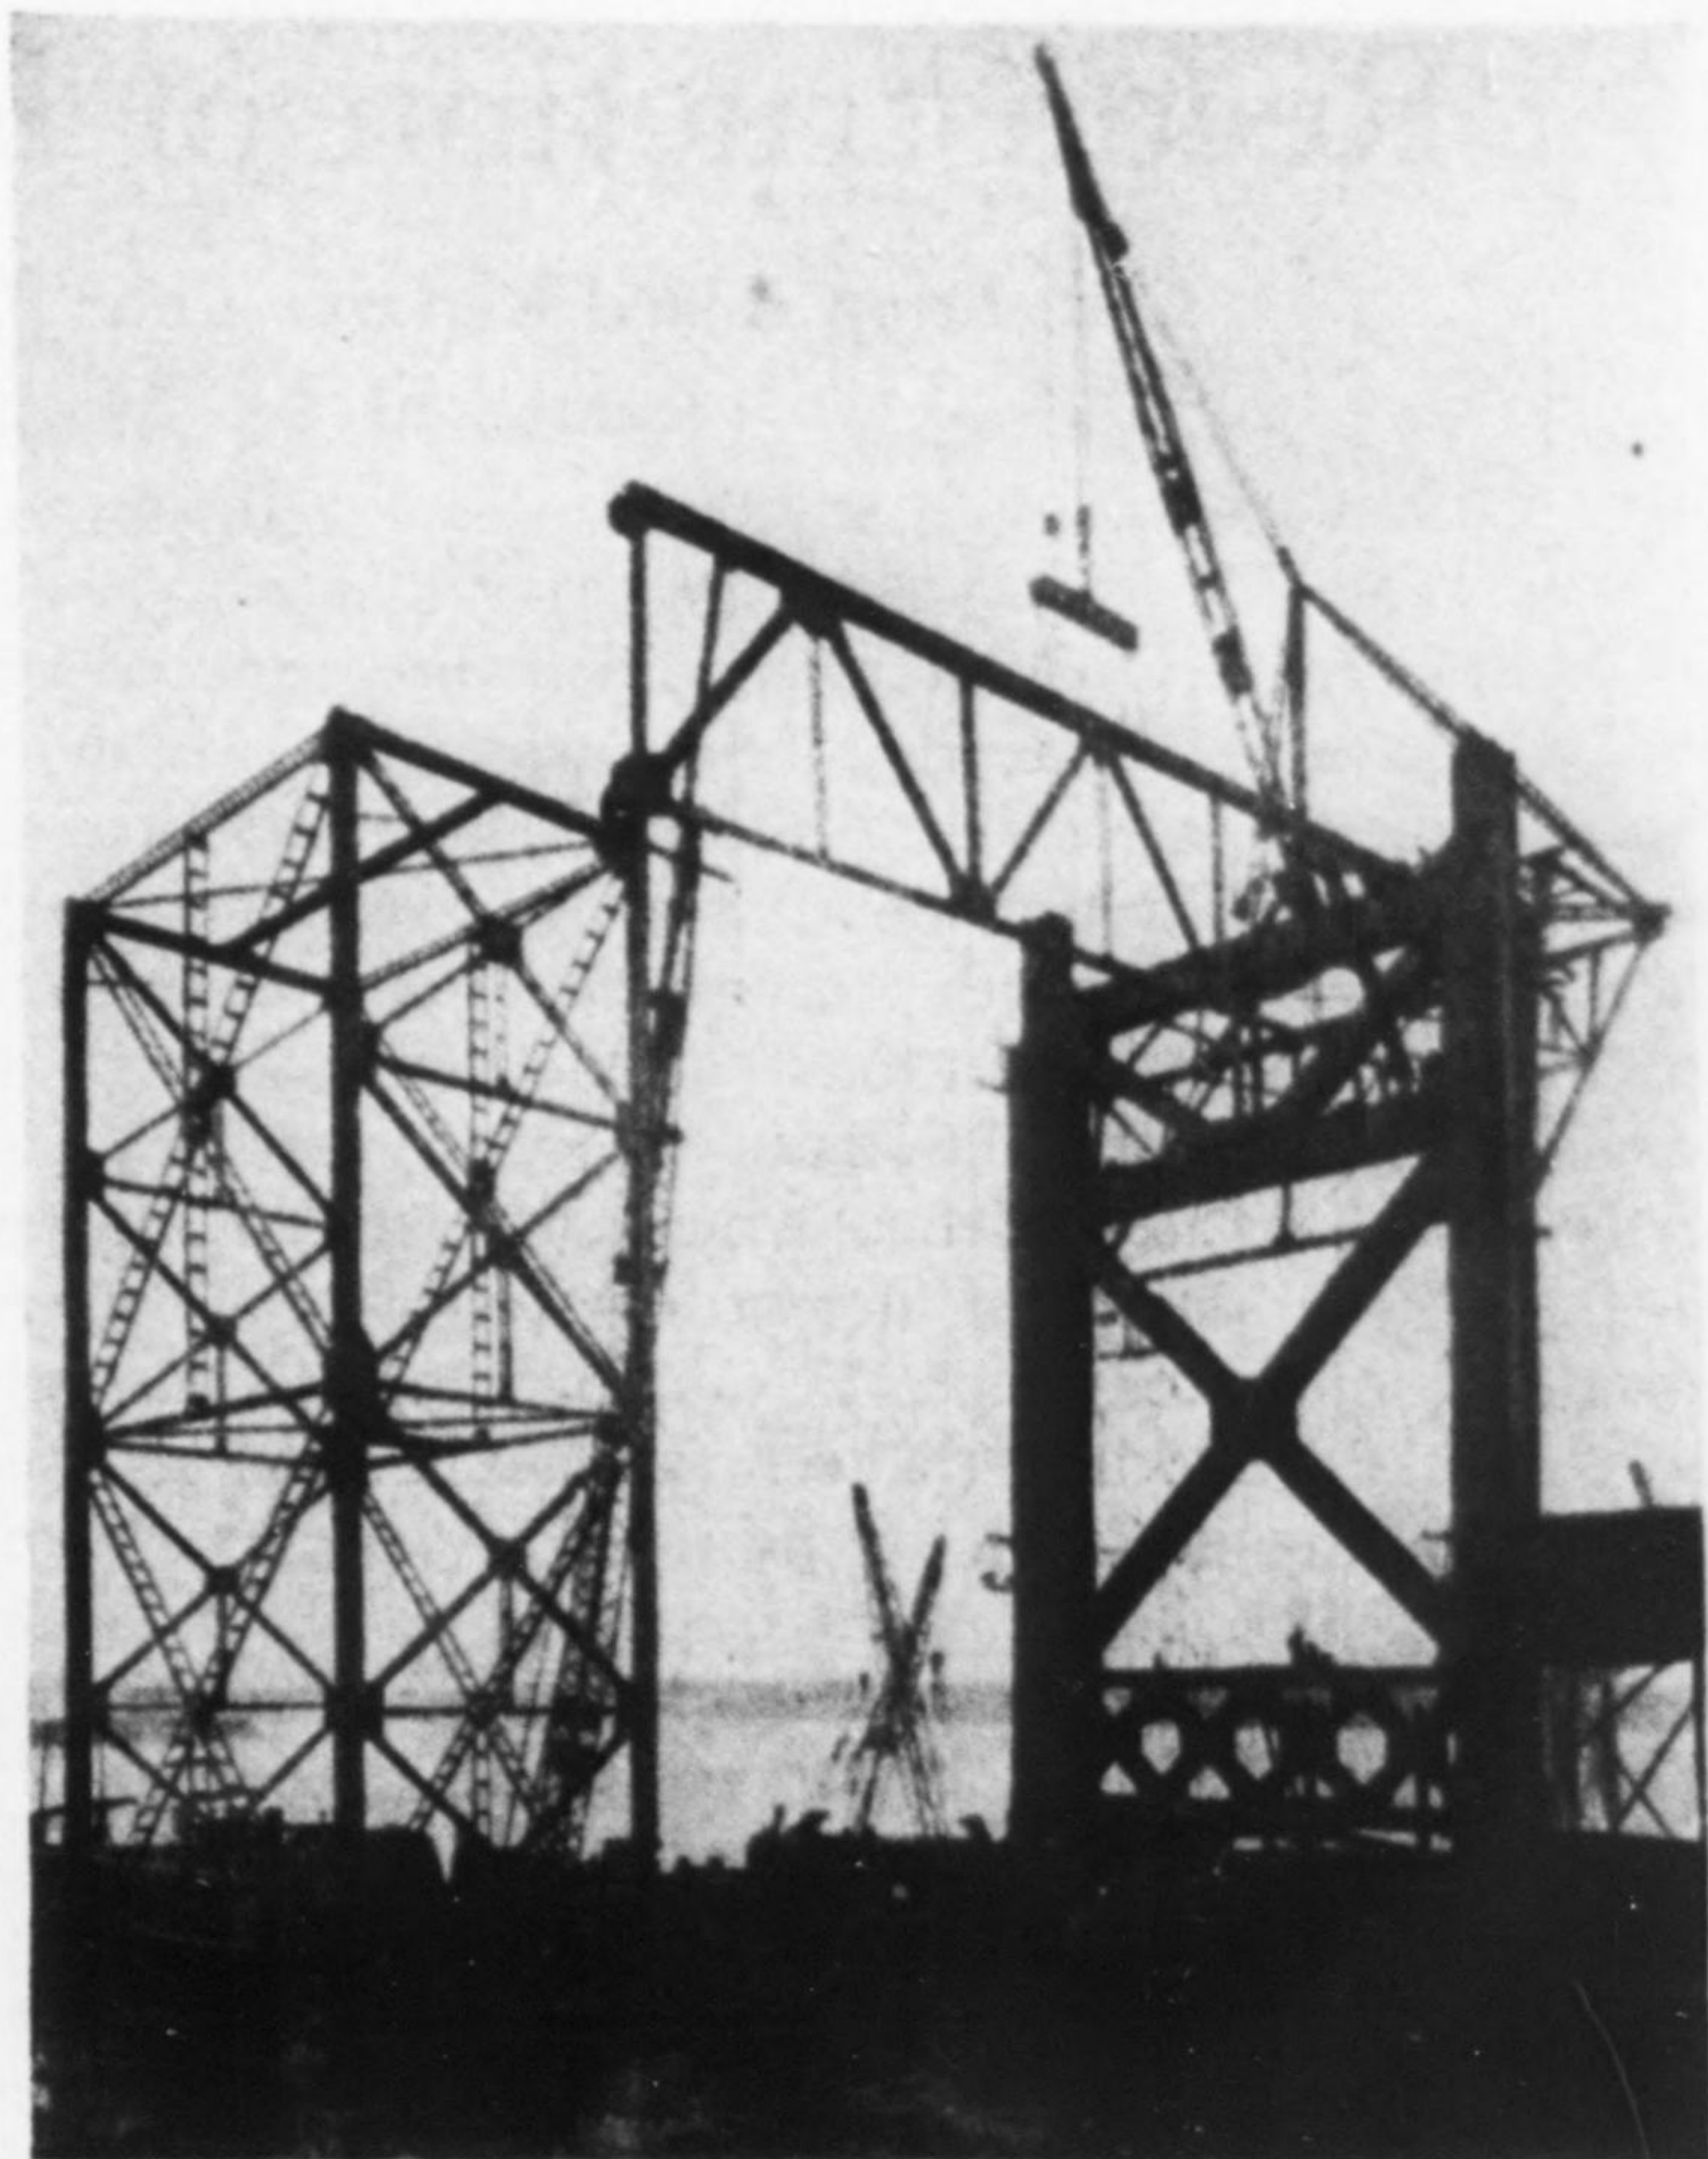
ERECTING APPROACH TRUSSES TO ASSURE FULL-HEIGHT STABILITY OF TOWER
